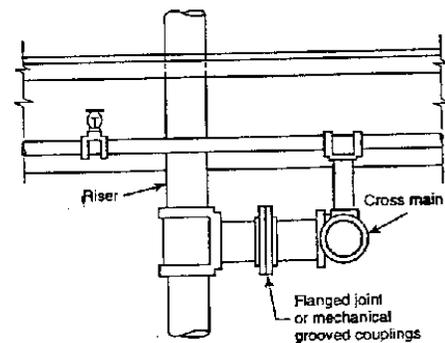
One arrangement of flanged joint at sprinkler riser.
